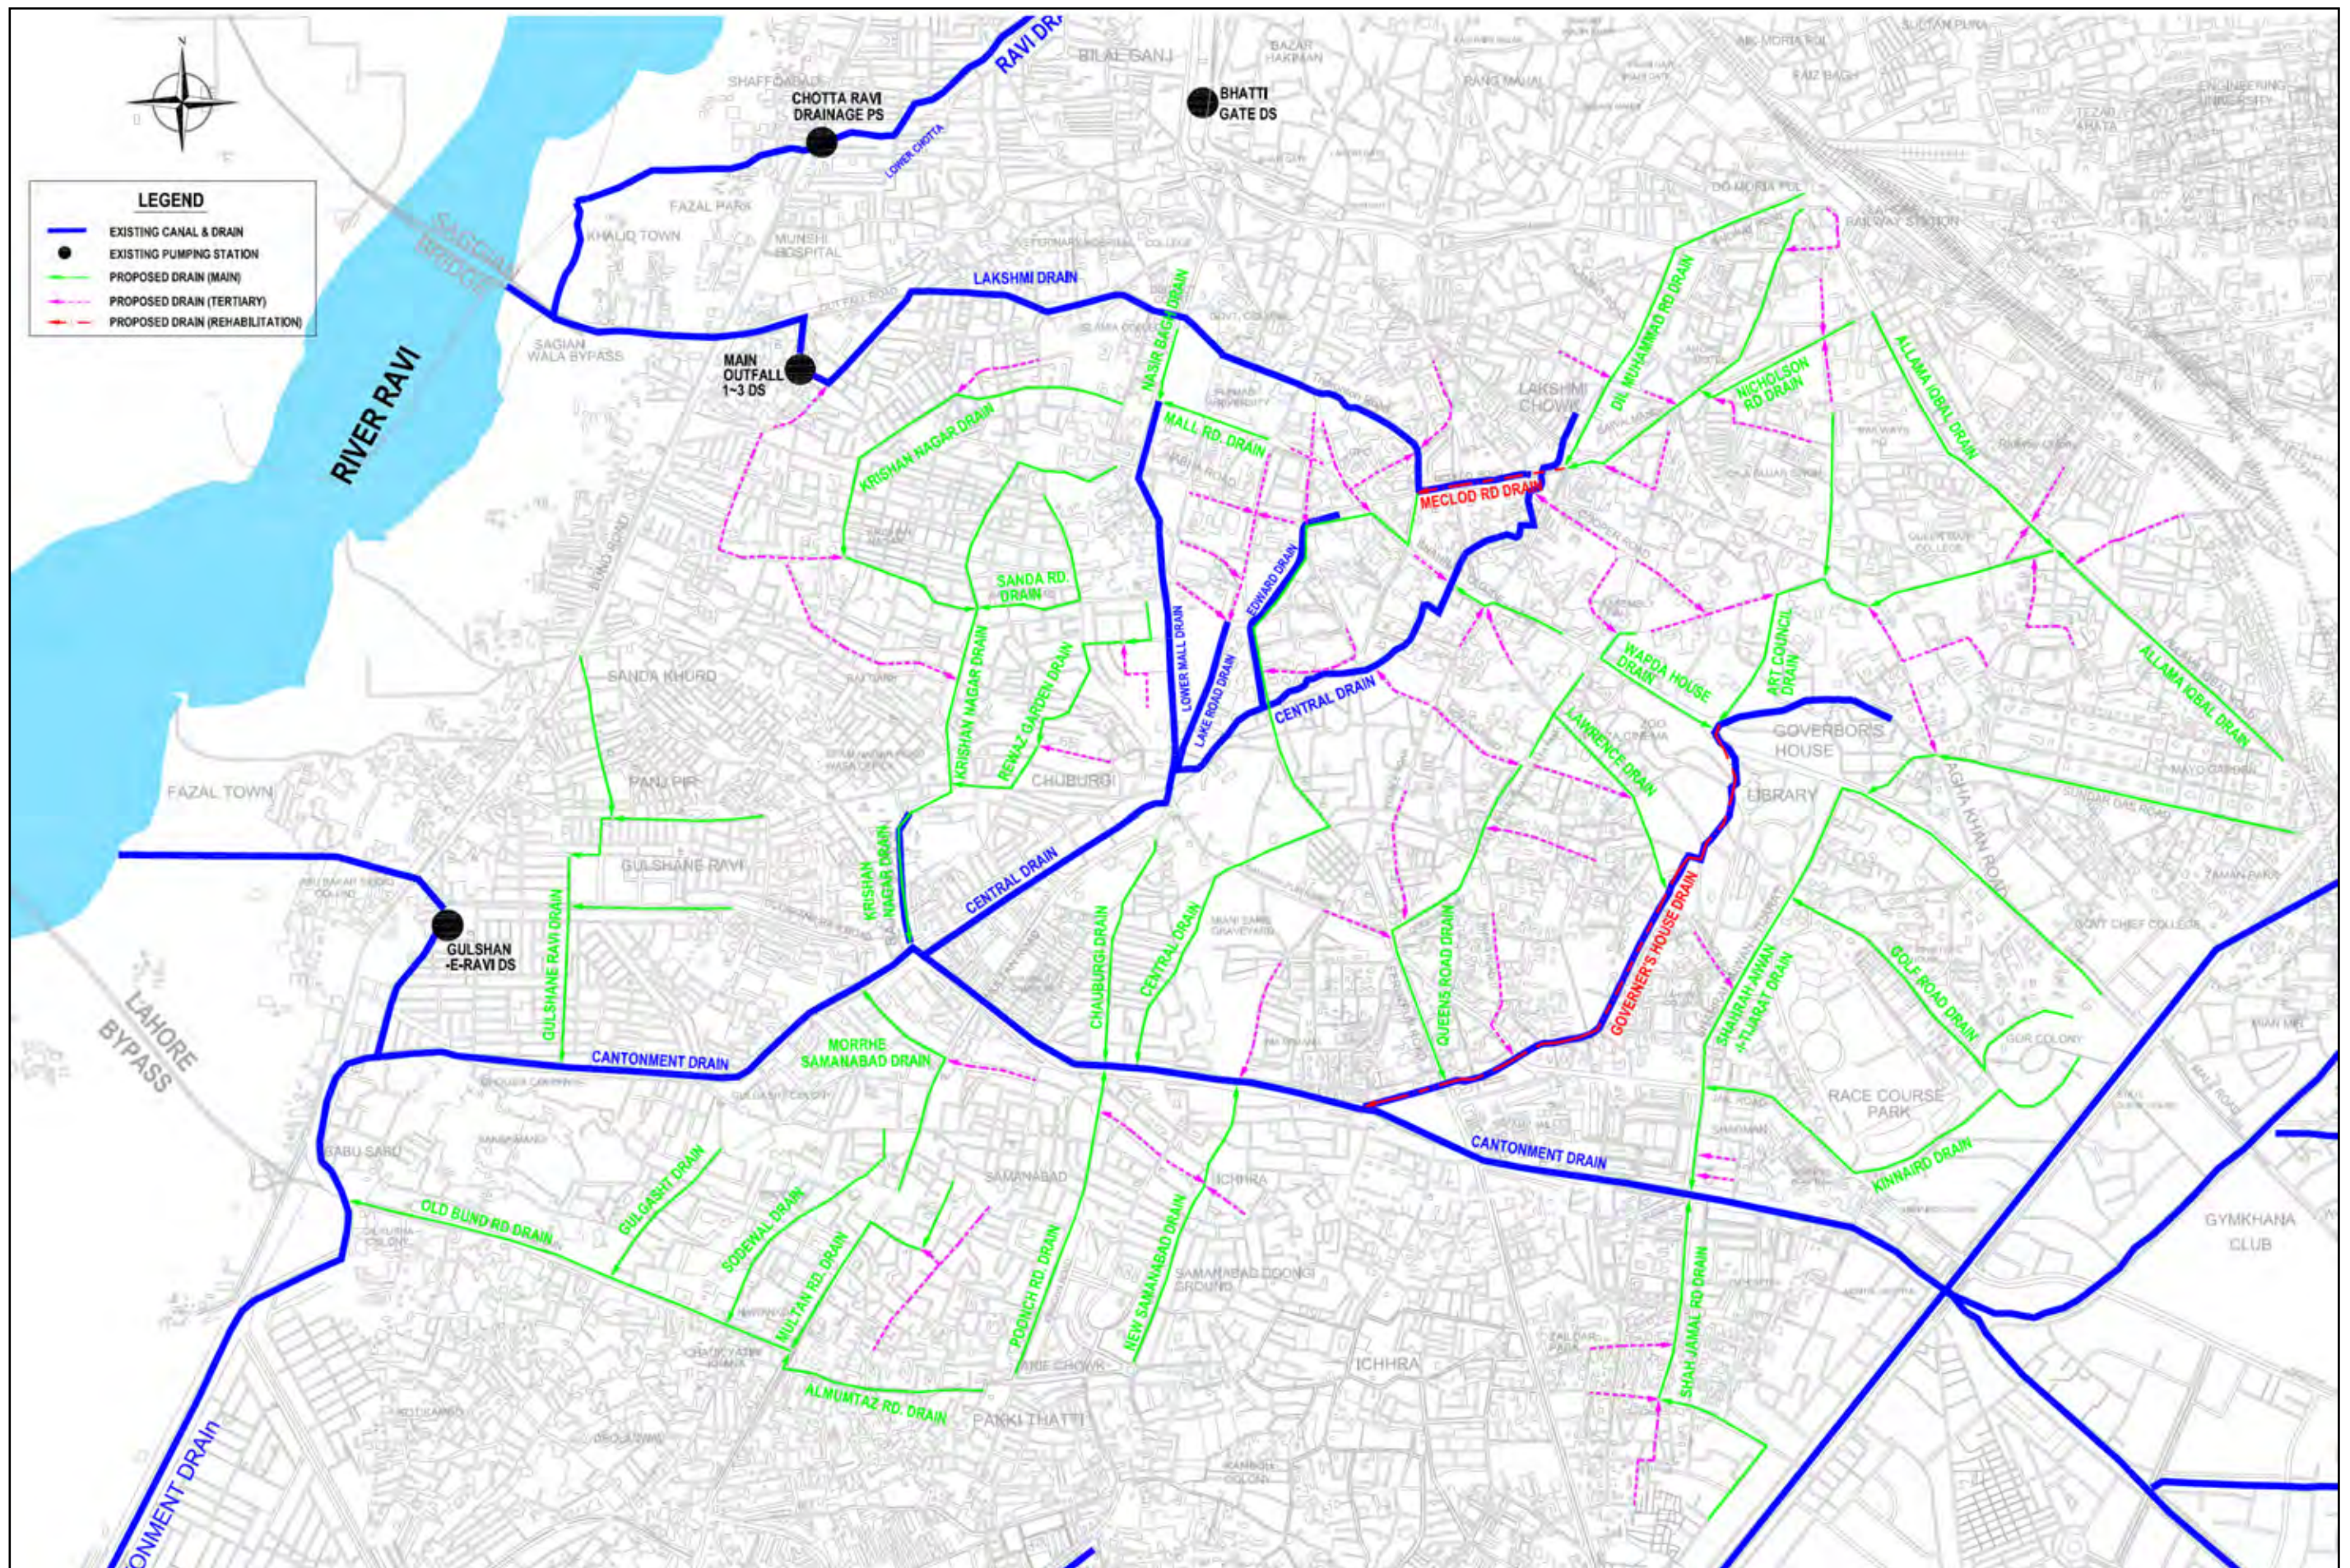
Plan of Proposed Drainage Facilities of Phase 1 Project
